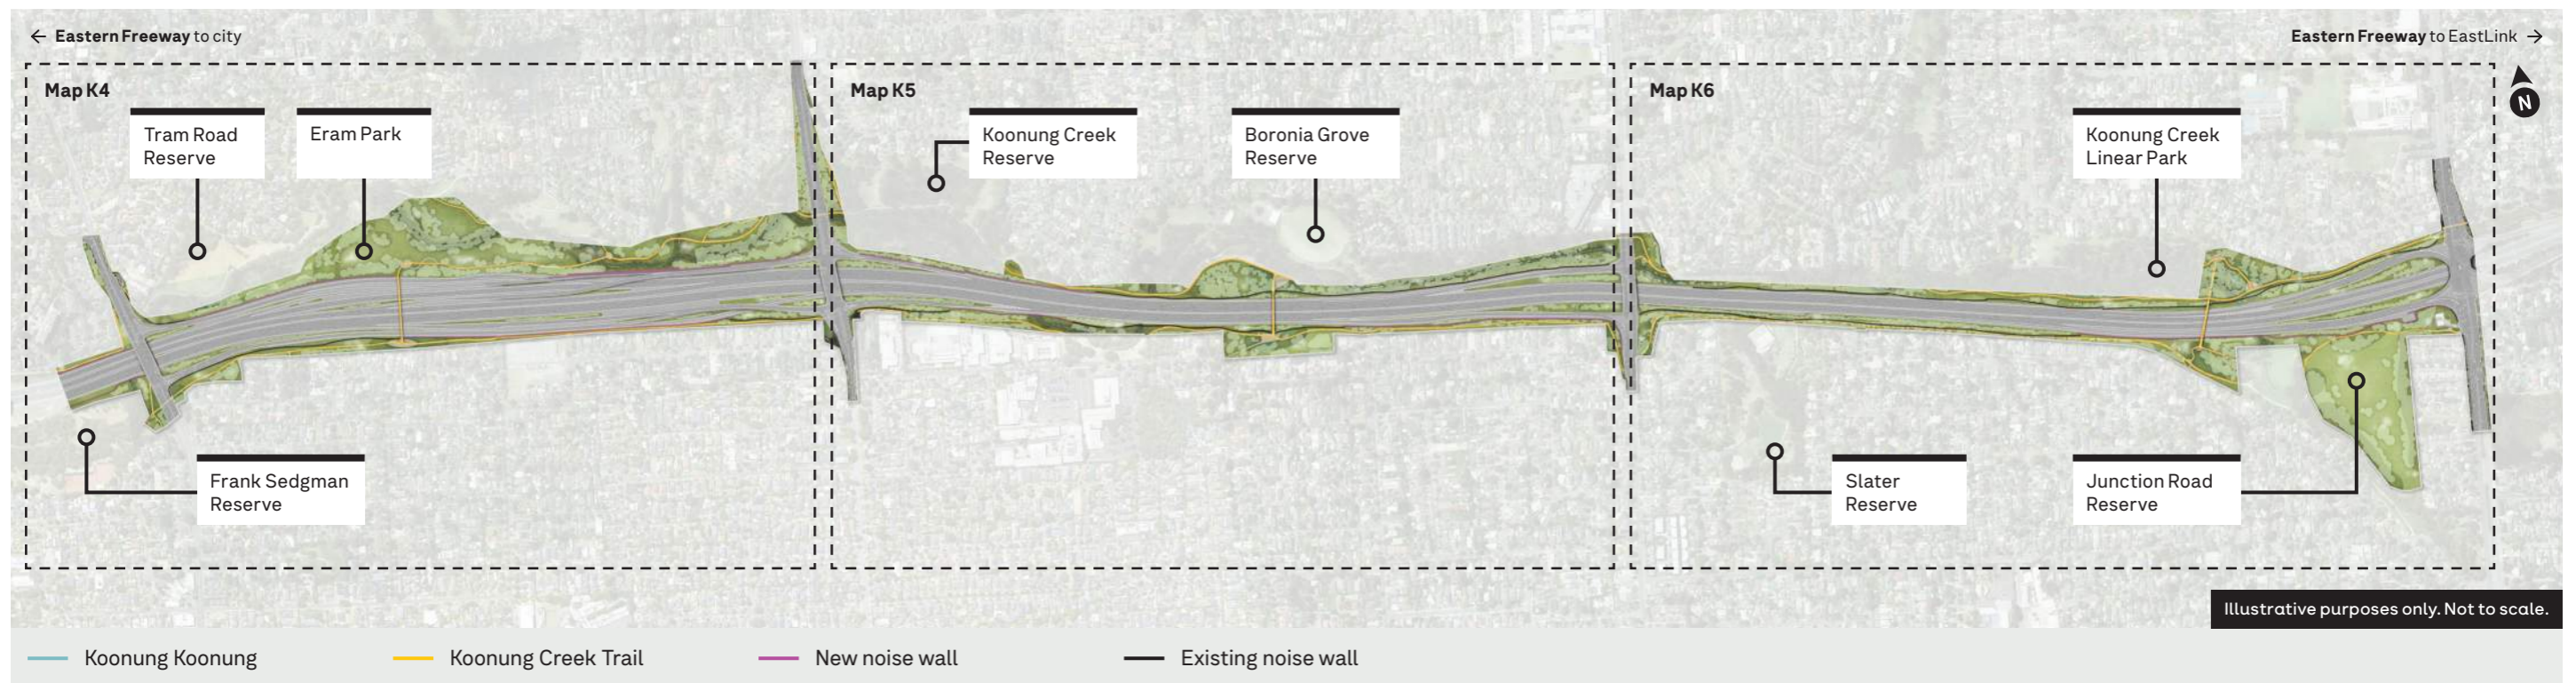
Koonung Creek Valley Landscape Character Area – Tram Road to Springvale Road extent
